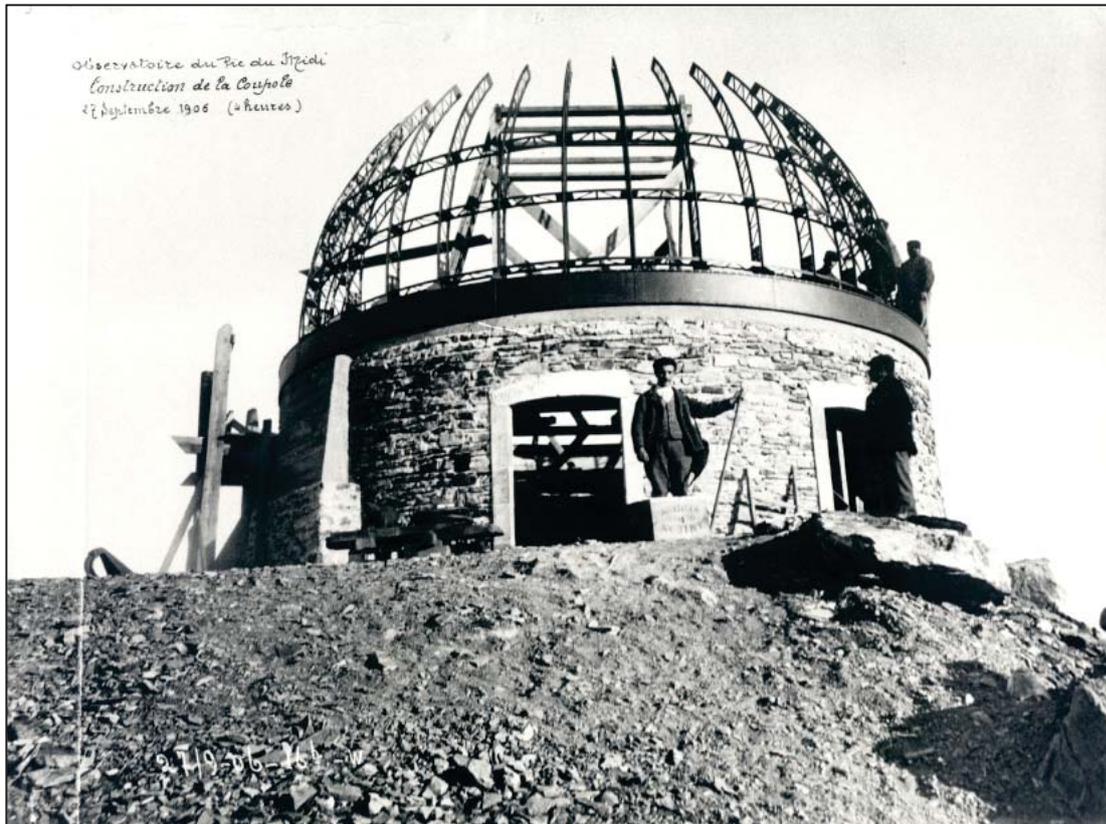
Construction of the Baillaud Dome in 1907. Photo © Alix, Fond Eyssalet
